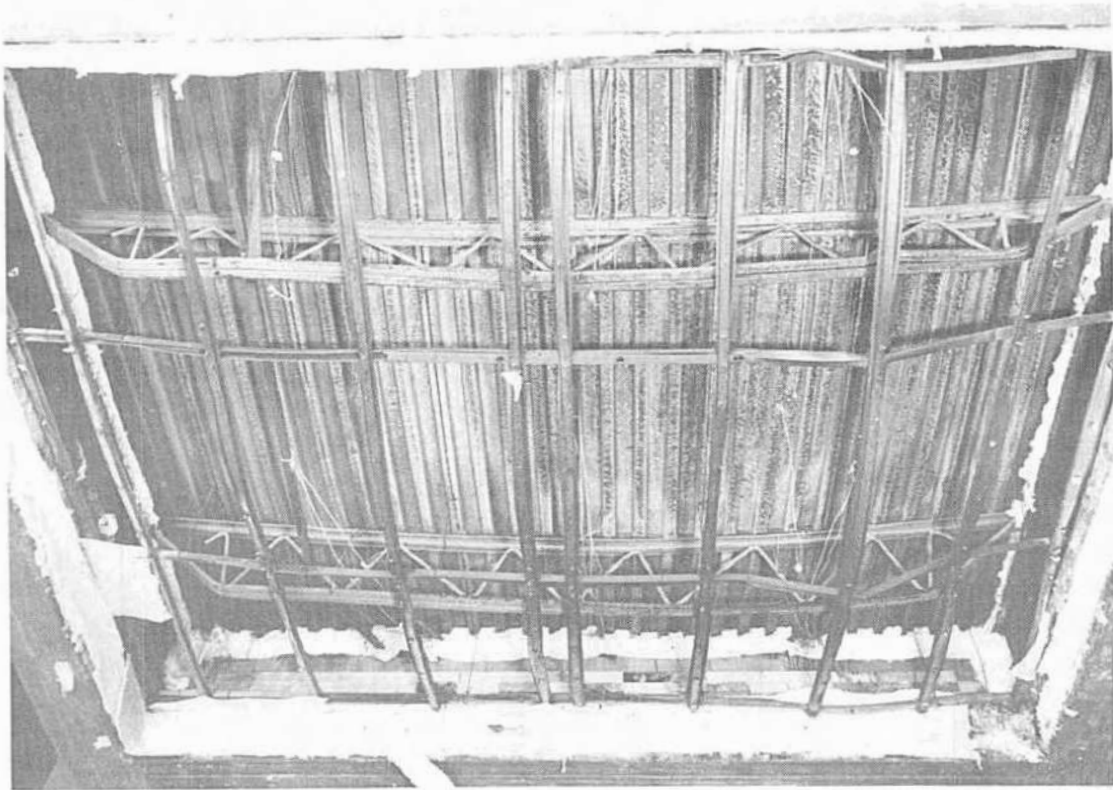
ASSEMBLY NO. 1 AFTER FIRE TEST
